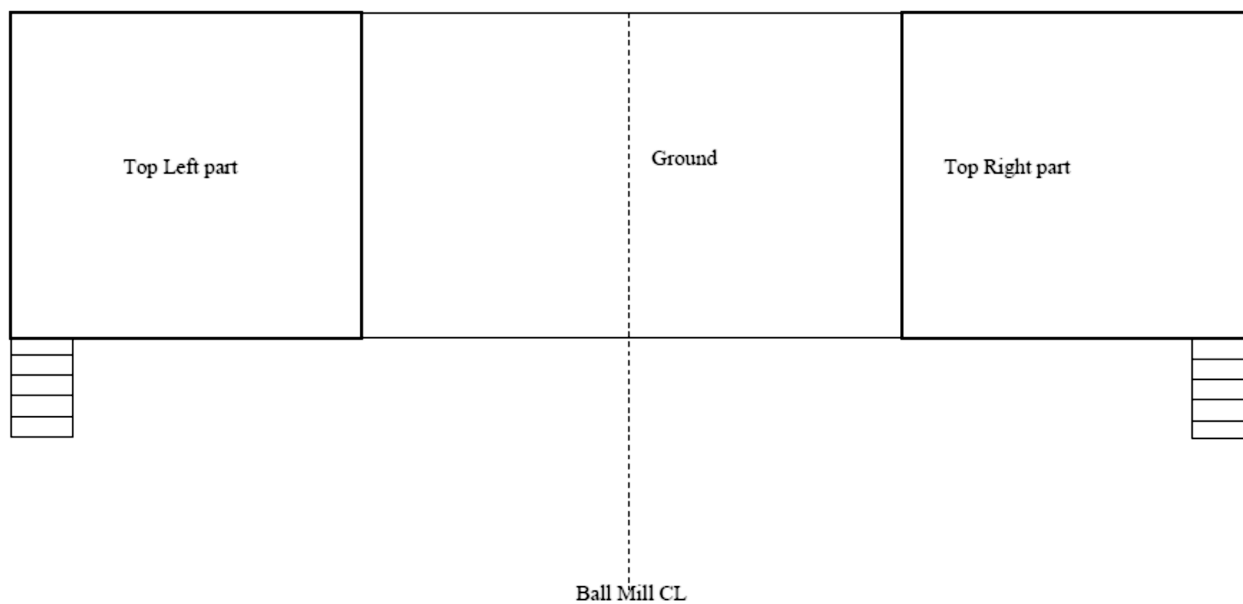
Ball mill foundation plan (*note: drawing is not in scale*)
